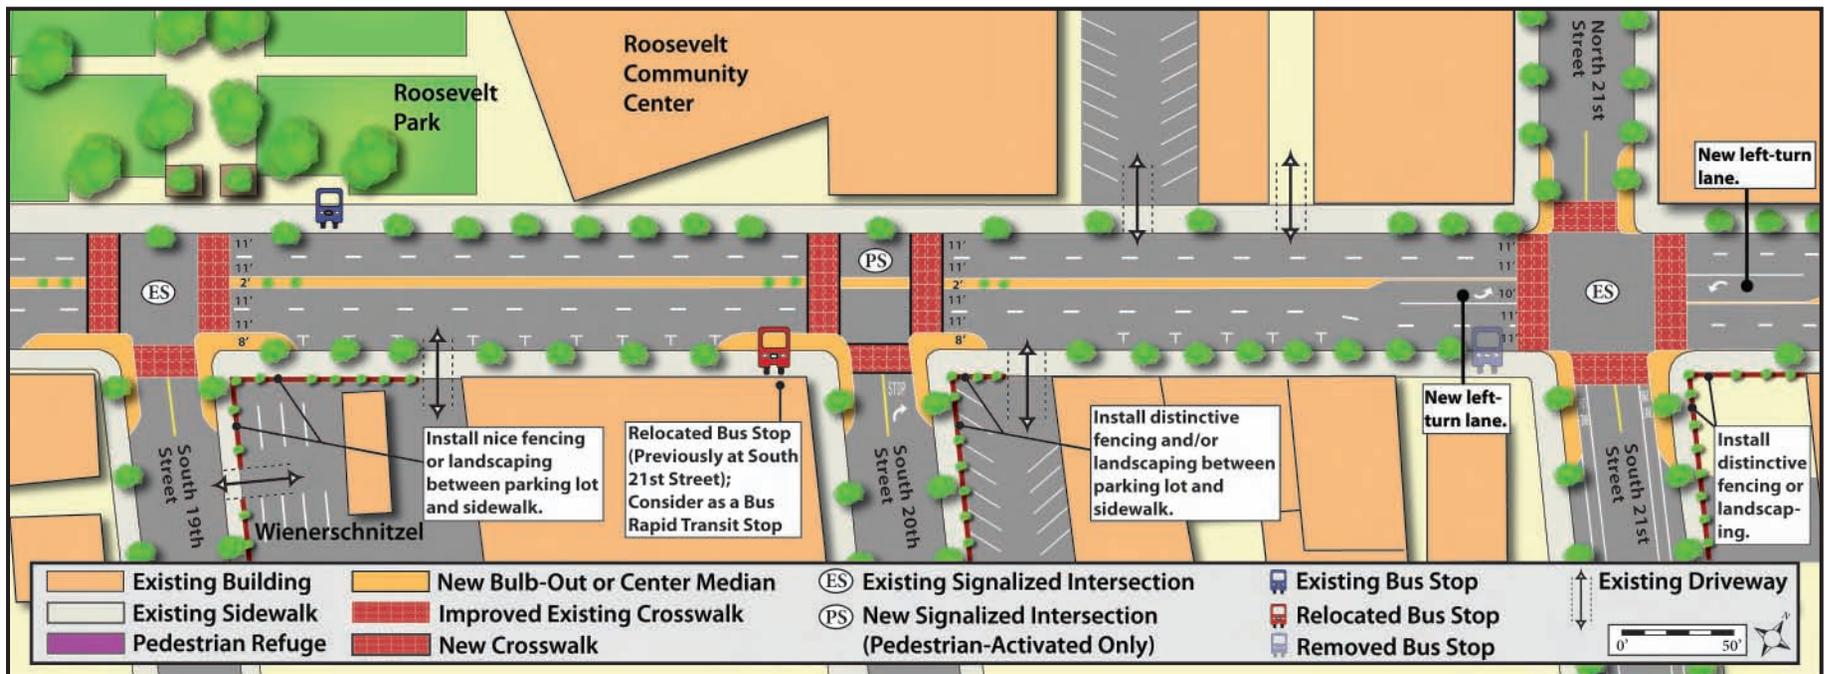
East Santa Clara Street/Alum Rock Avenue - Segment #1.
